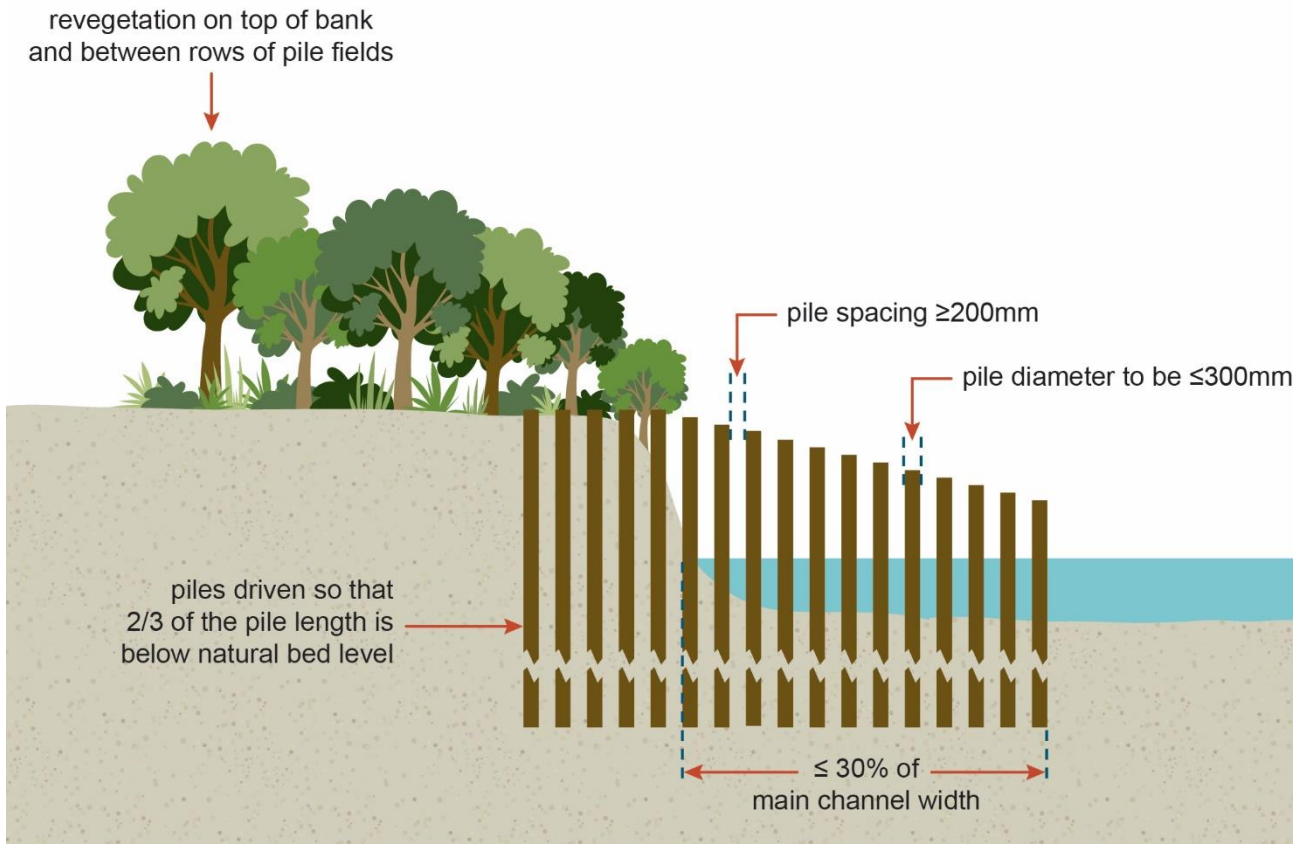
Row of piles (cross-section of part-waterway) – purple, red, amber and green waterways
